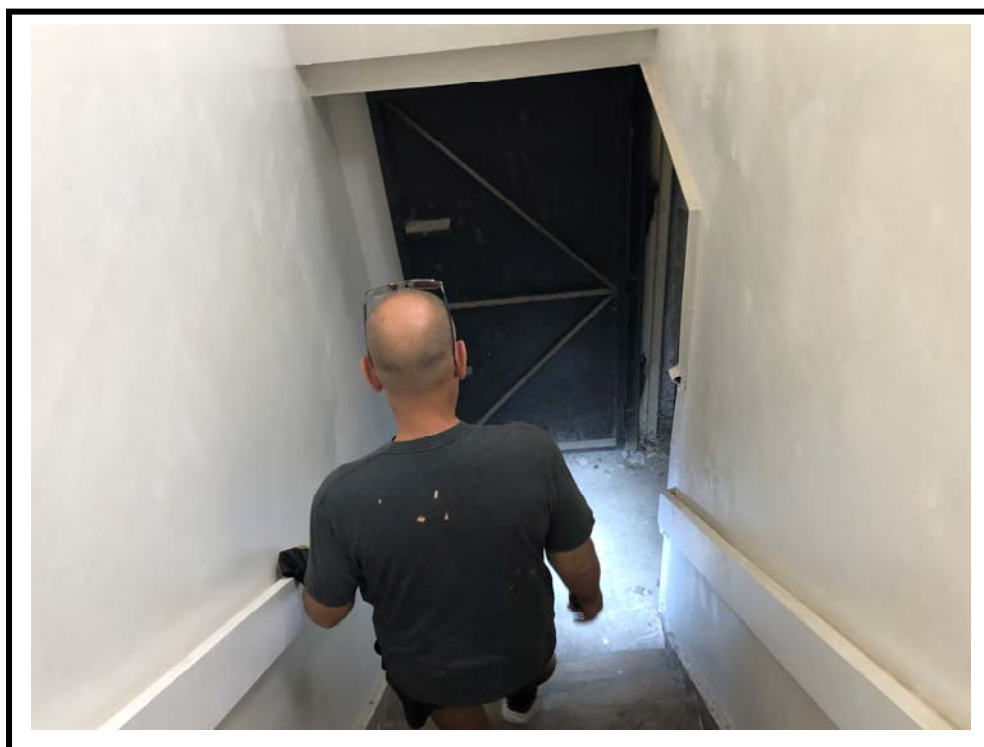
PHOTO LOCATION: Depicts the stairwell leading to the cellar of the building.
